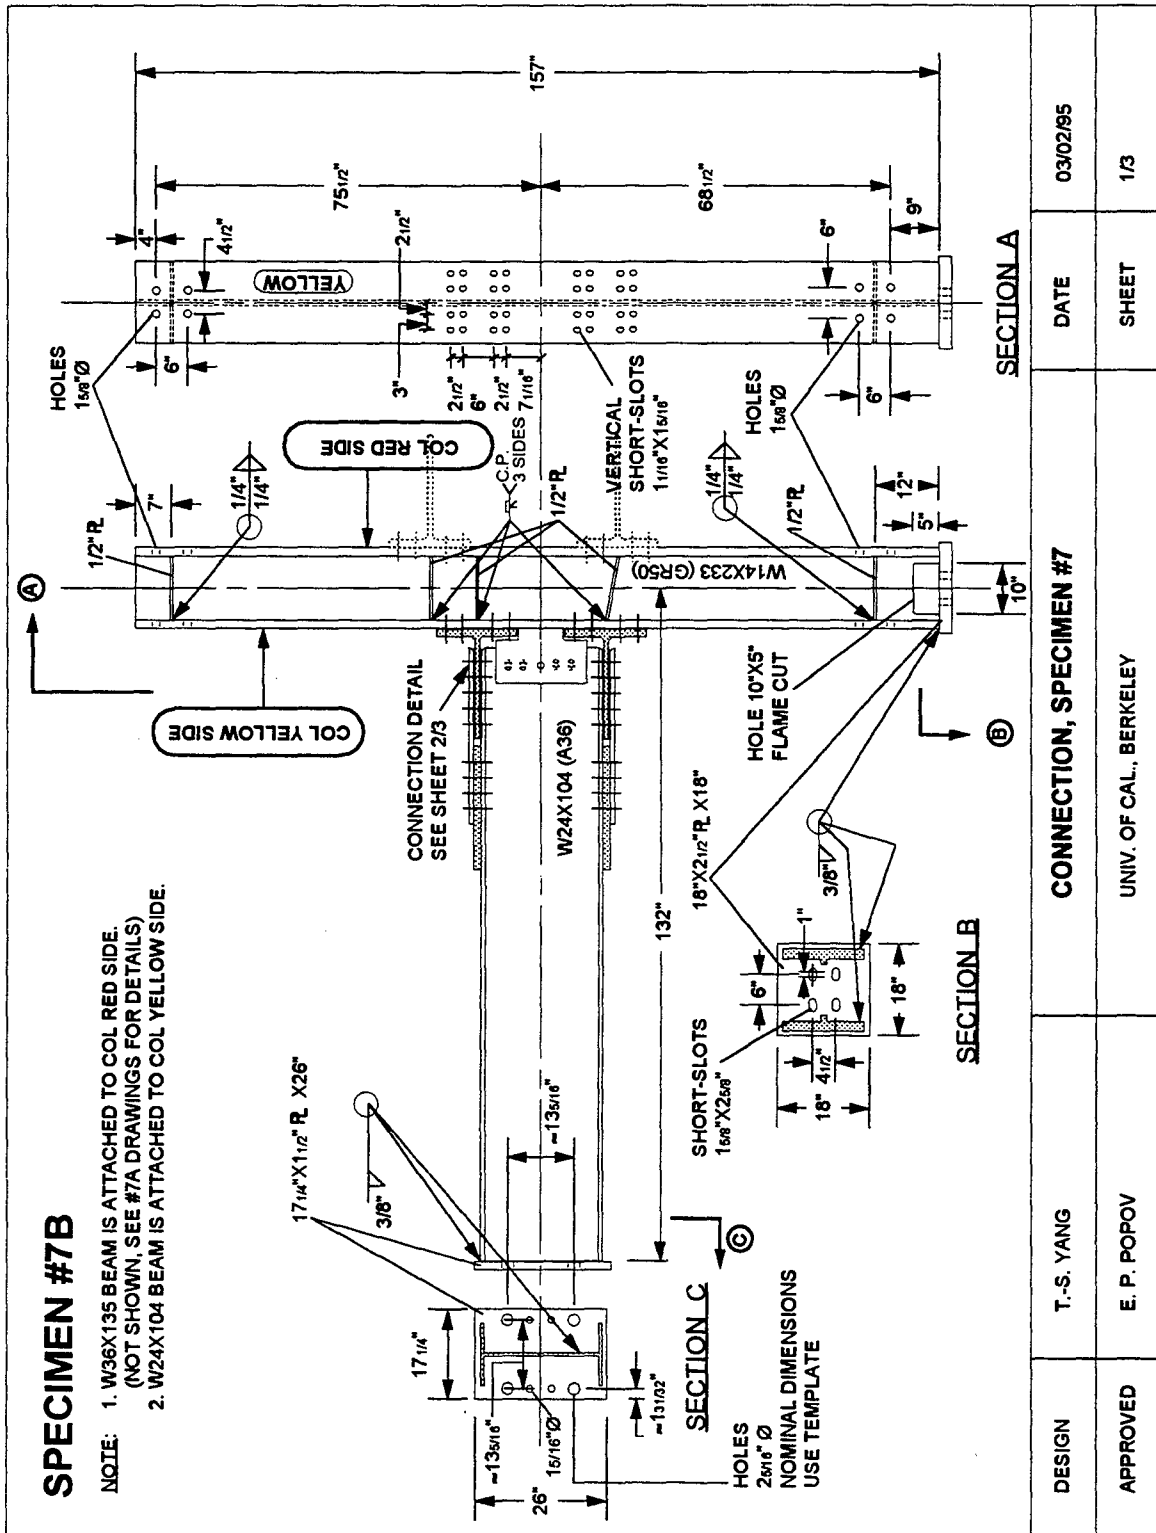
Detail of a rotational friction damper: Specimen 7B (Sheet 1/3).
